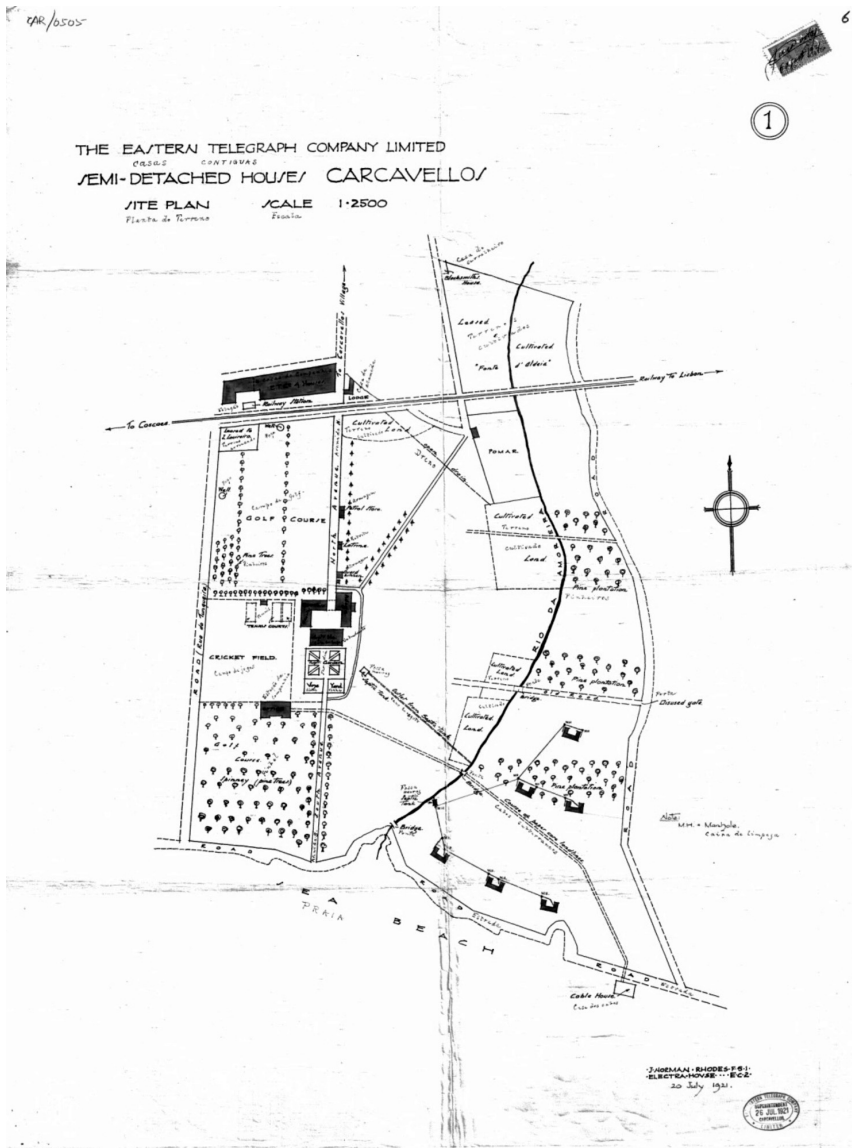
Topographic plan of new buildings in Quinta Nova, 1921.
